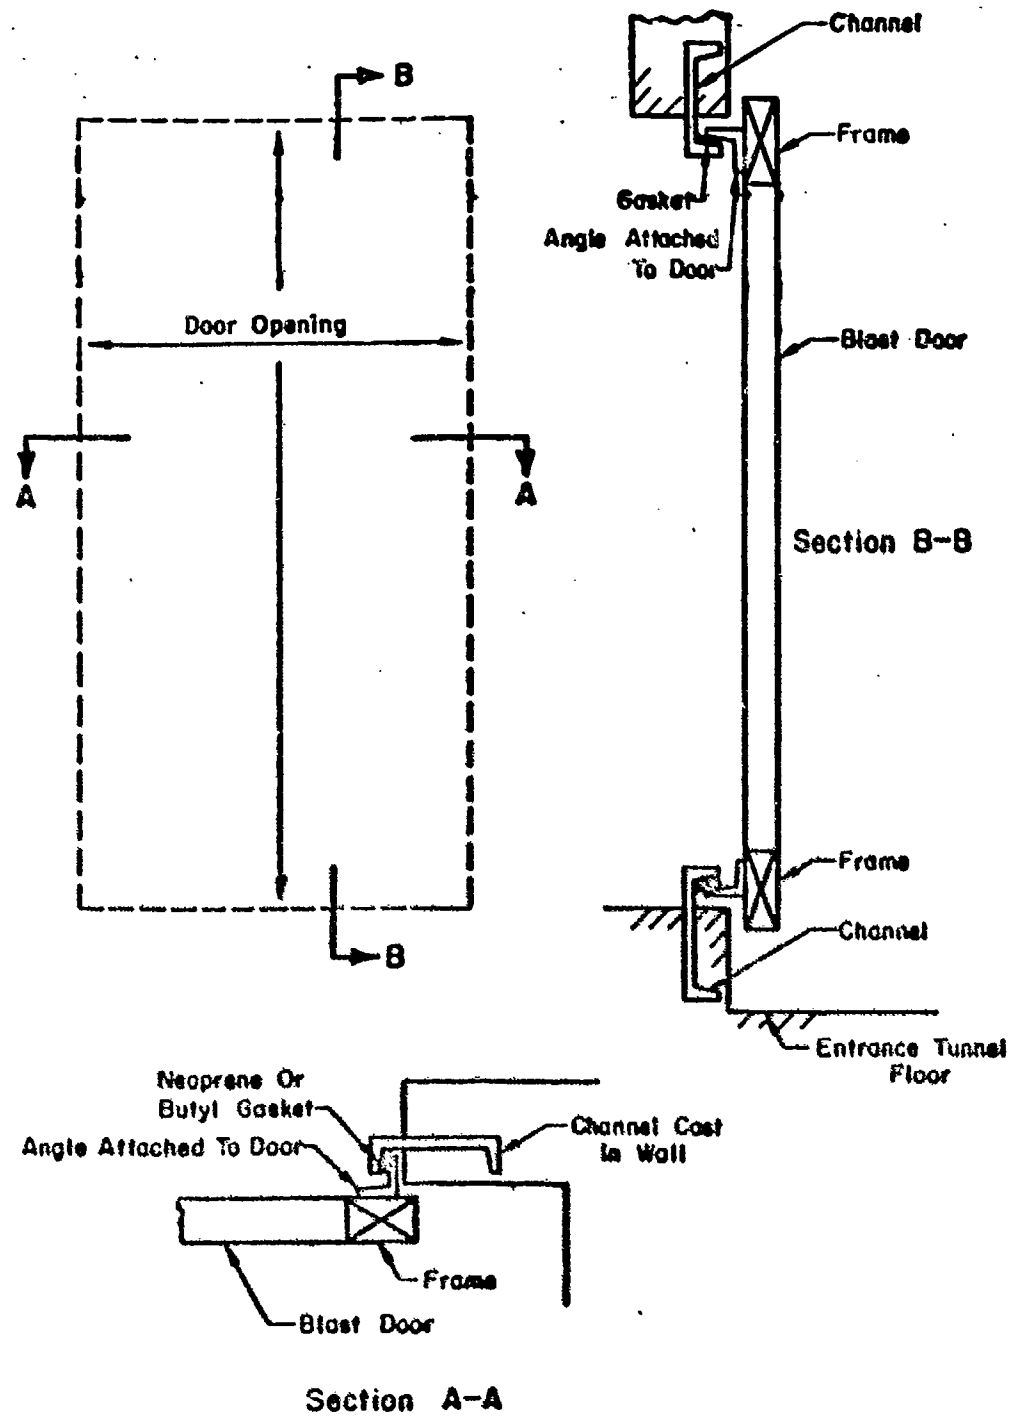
PASSIVE DOOR SEAL, TYPE D
